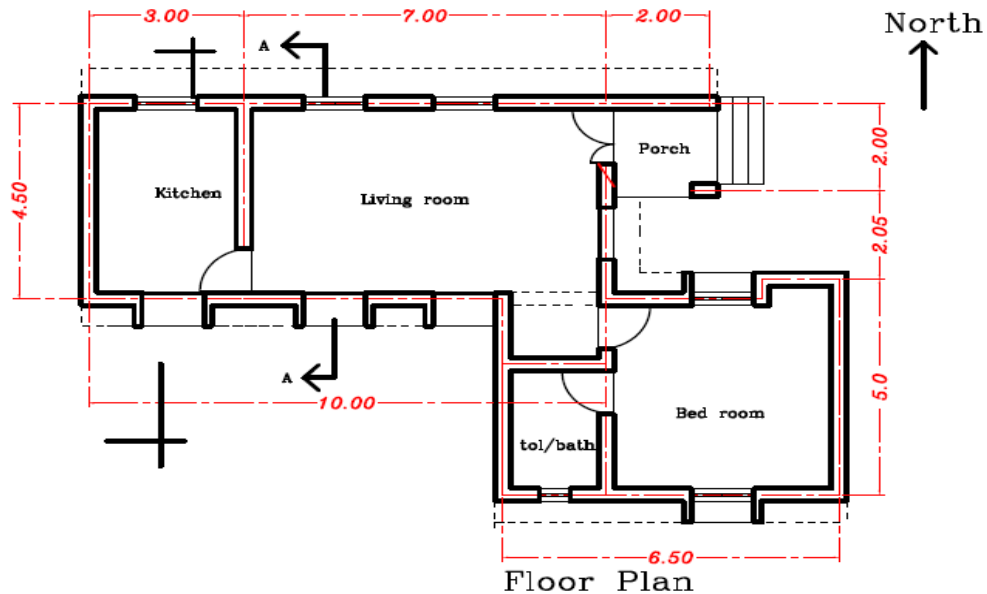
Floor Plan of a one-bedroom flat in Khartoum city
